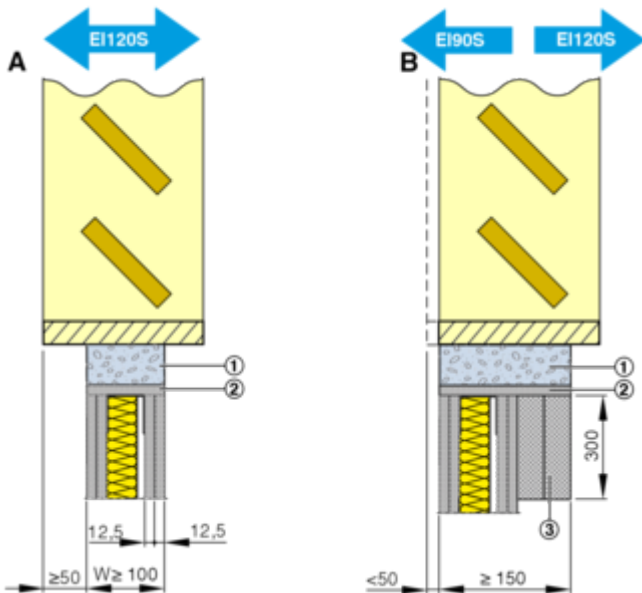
EK-JZ Installation centred or flush on one side (overhang <50 mm)
